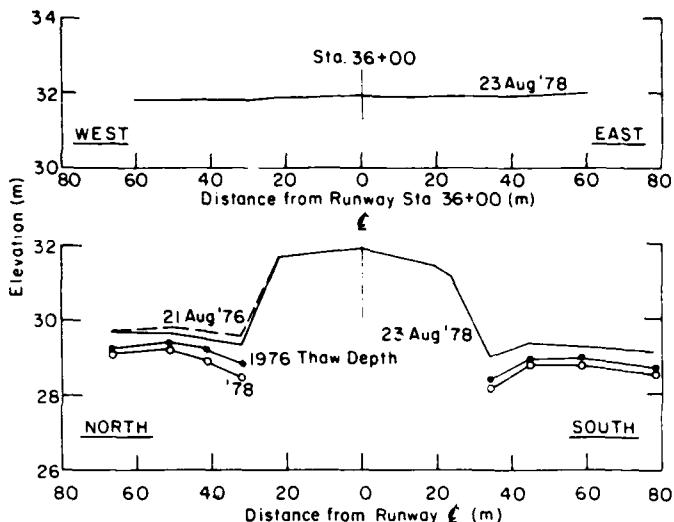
Surface elevations at the west site, Old Man Airfield. The upper drawing is the centerline profile; the lower drawing is the cross section at runway station 36+00.
